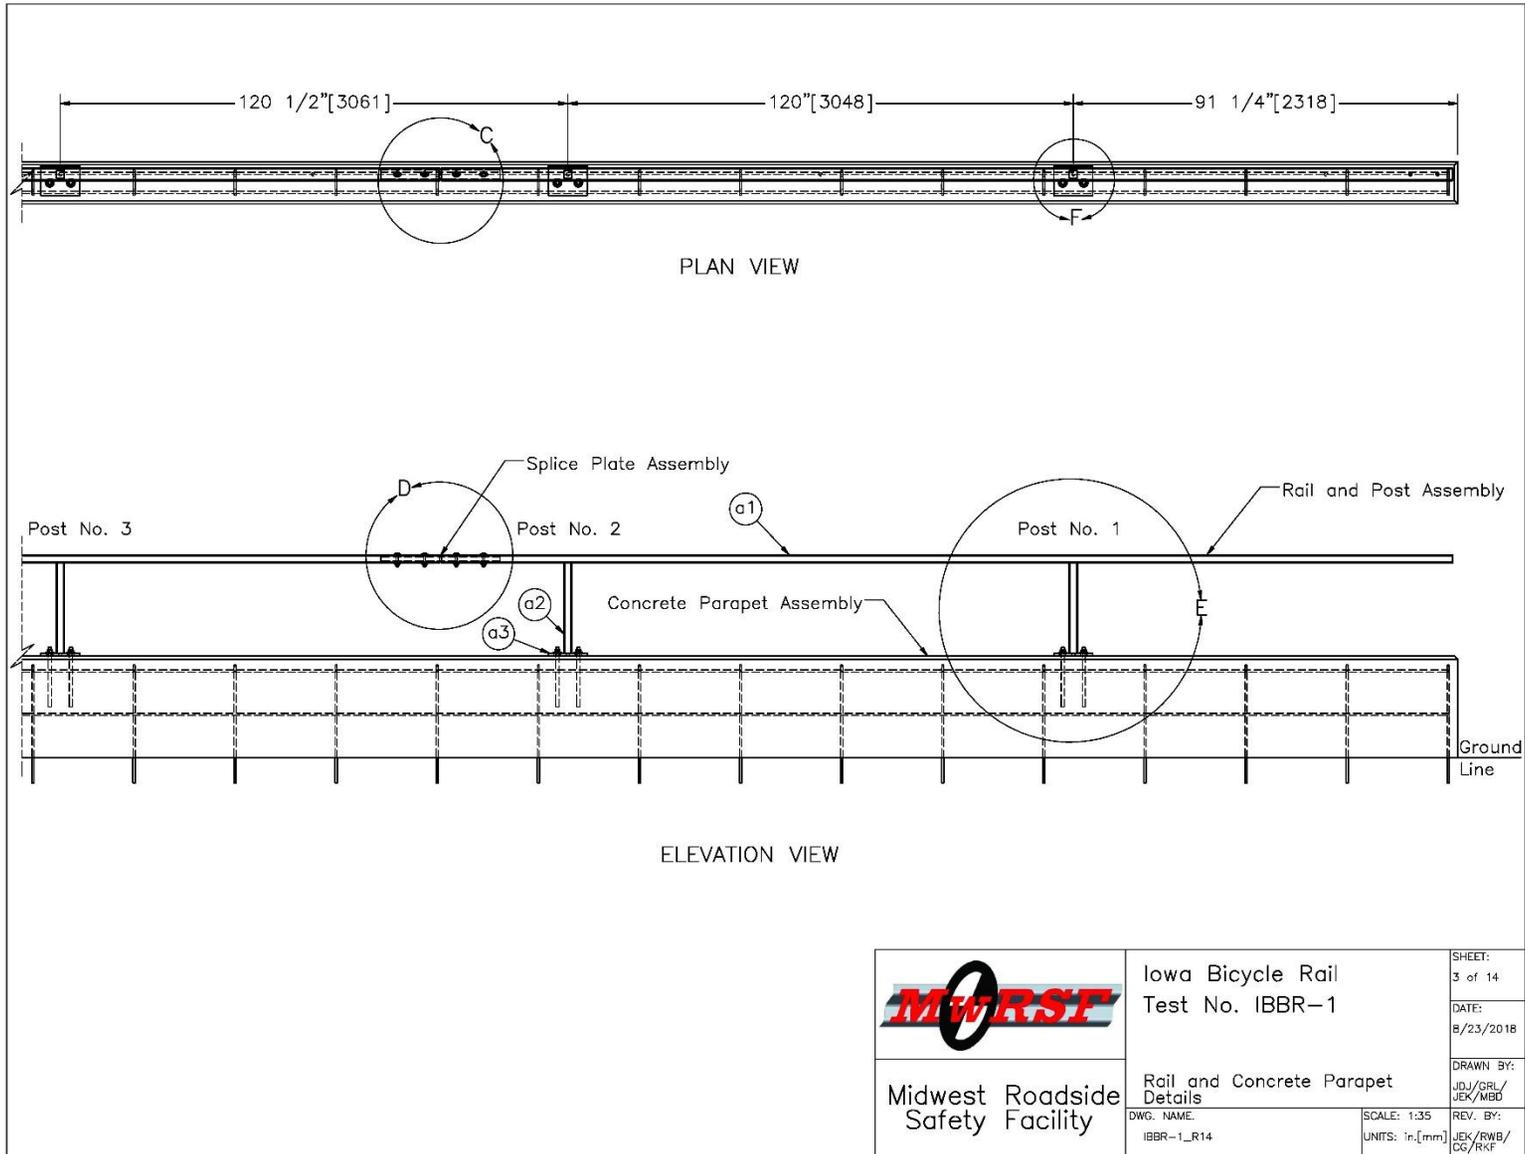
Rail and Concrete Parapet Overview, Test No. IBBR-1
